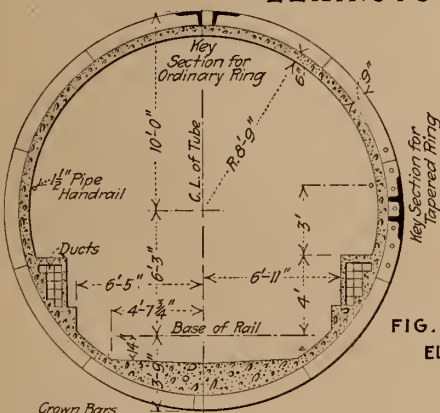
CROSS-SECTION AND PART ELEVATION OF VESEY STREET CAST-IRON LINED TUNNEL
